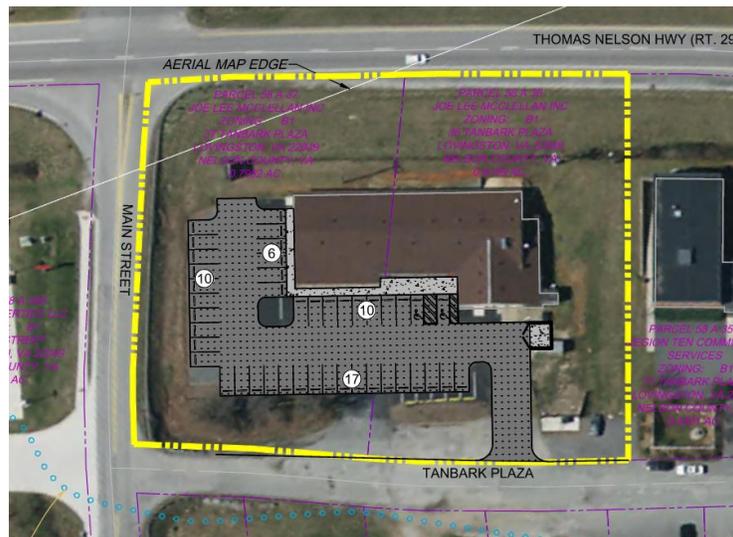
illustrates how a new parking layout could work if the existing building is renovated.
